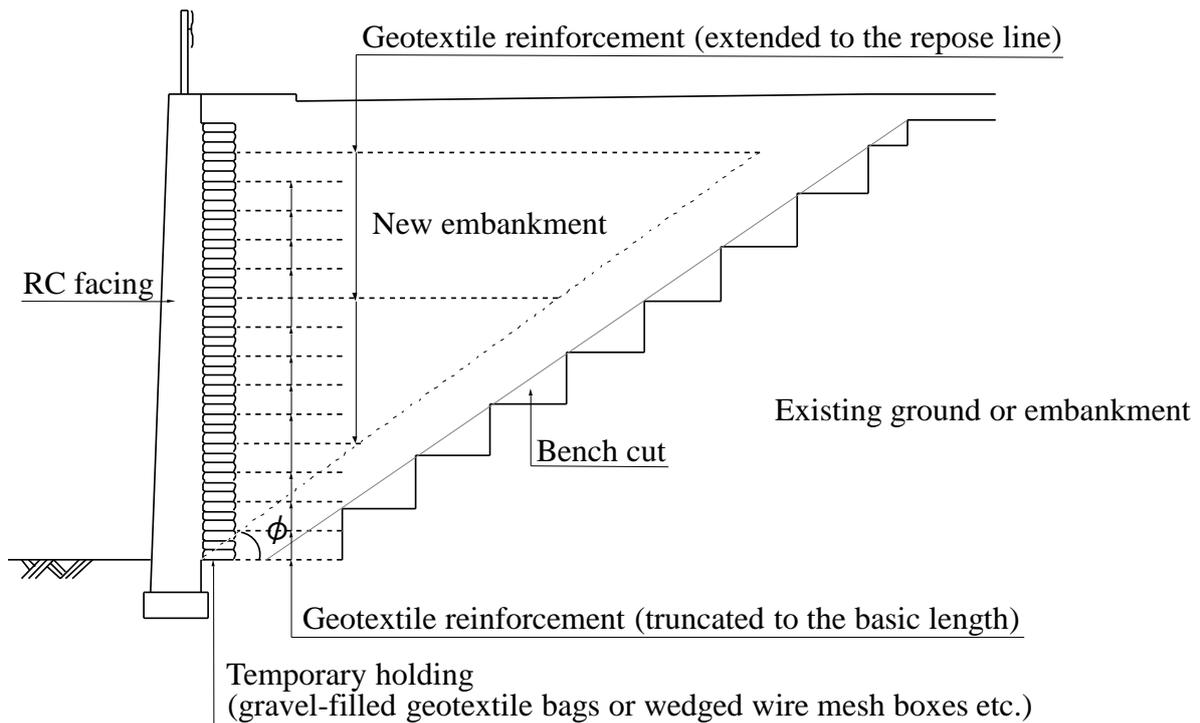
(b) Standard drawing of RRR-B structure widening the embankment
